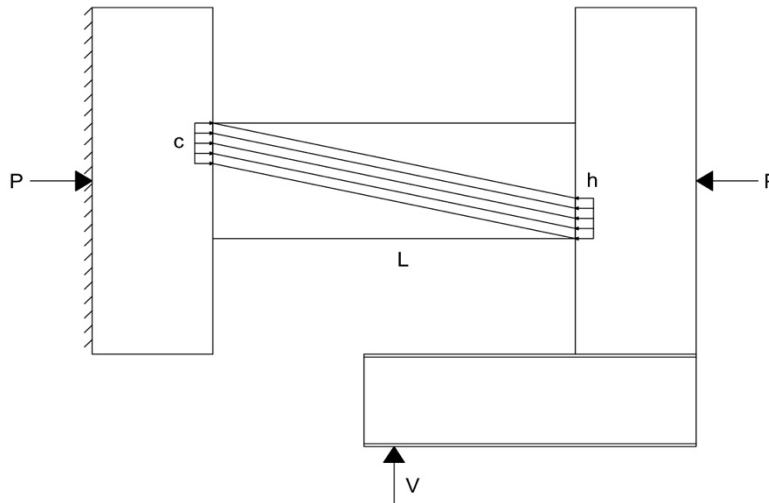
Idealized concrete strut for a typical specimen tested in this series
